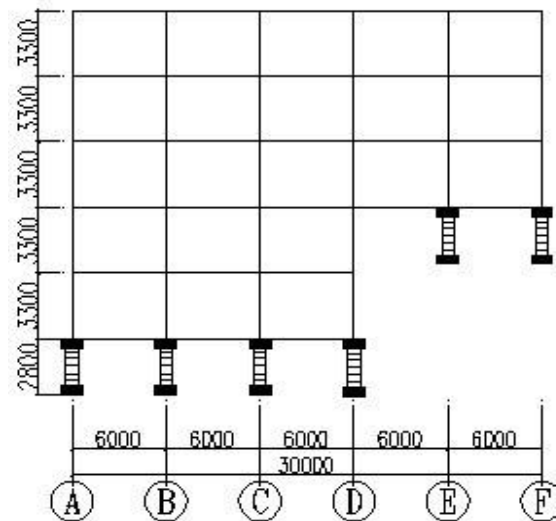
Elevation view of the C2K3 base-isolated frames supported by stepped foundation in mountainous. (A, B, C and D are upper grounding columns, and E and F are lower grounding columns).
